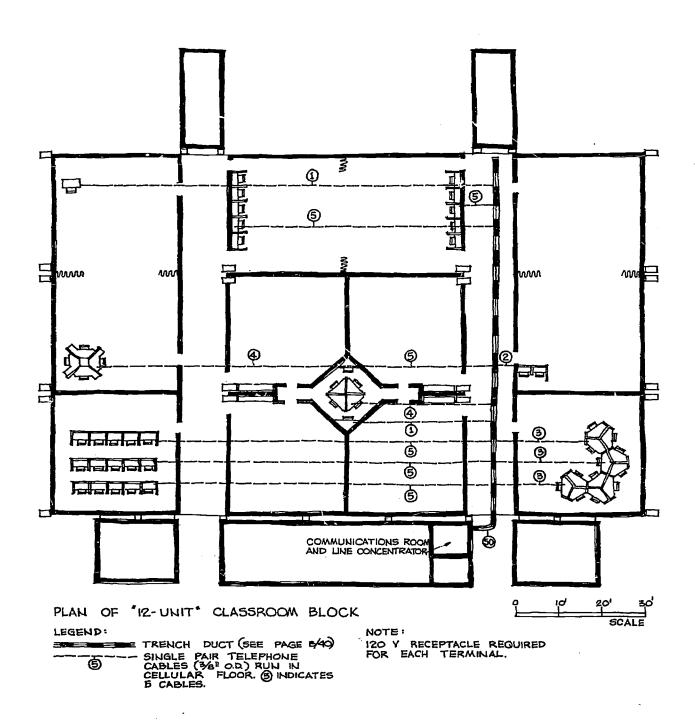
CABLING FOR 50 RCA "DRILL AND PRACTICE" TERMINALS
